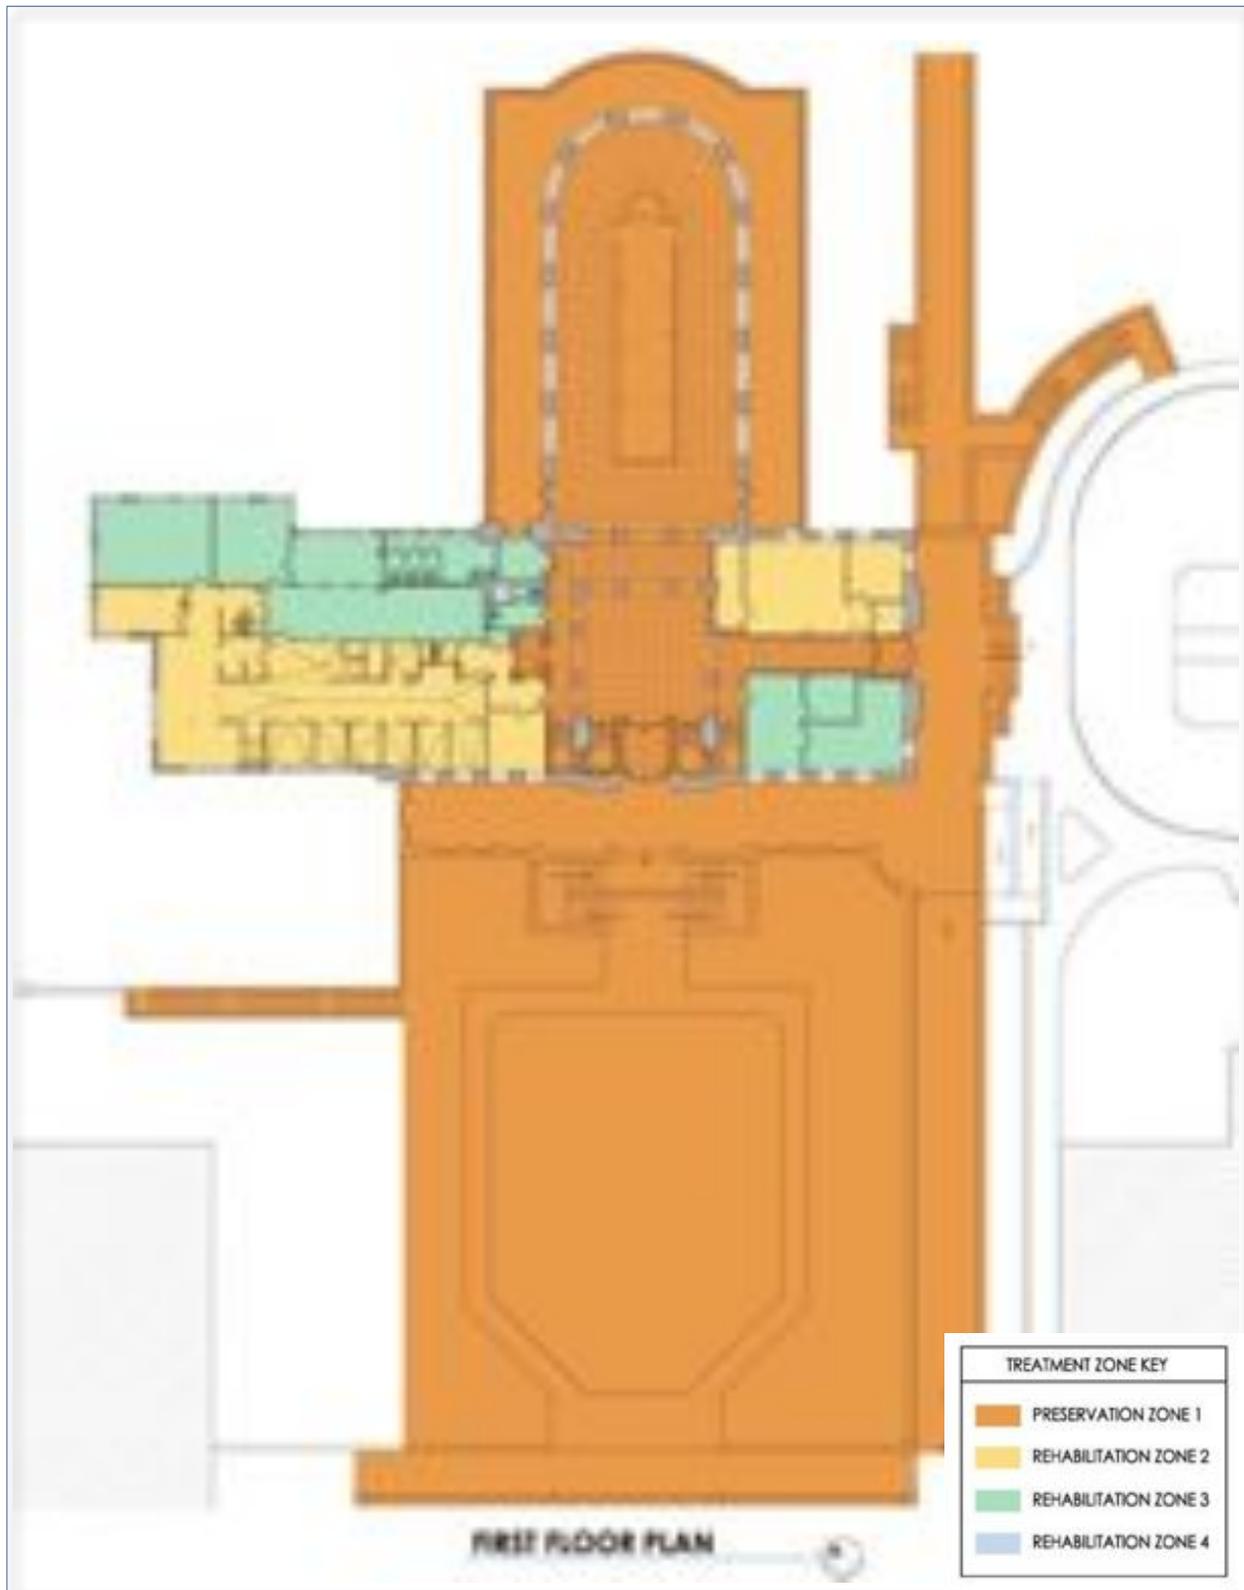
Preservation Treatment Zone Diagram – First Floor Plan (SRJA 2013)
